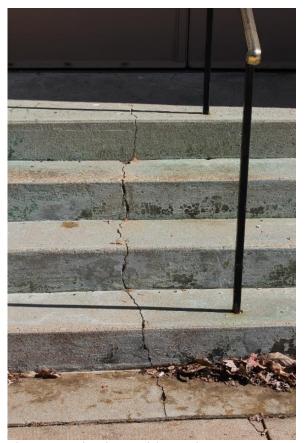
, Historic Renwick Courthouse, west elevation, view of a crack at the front concrete steps.
